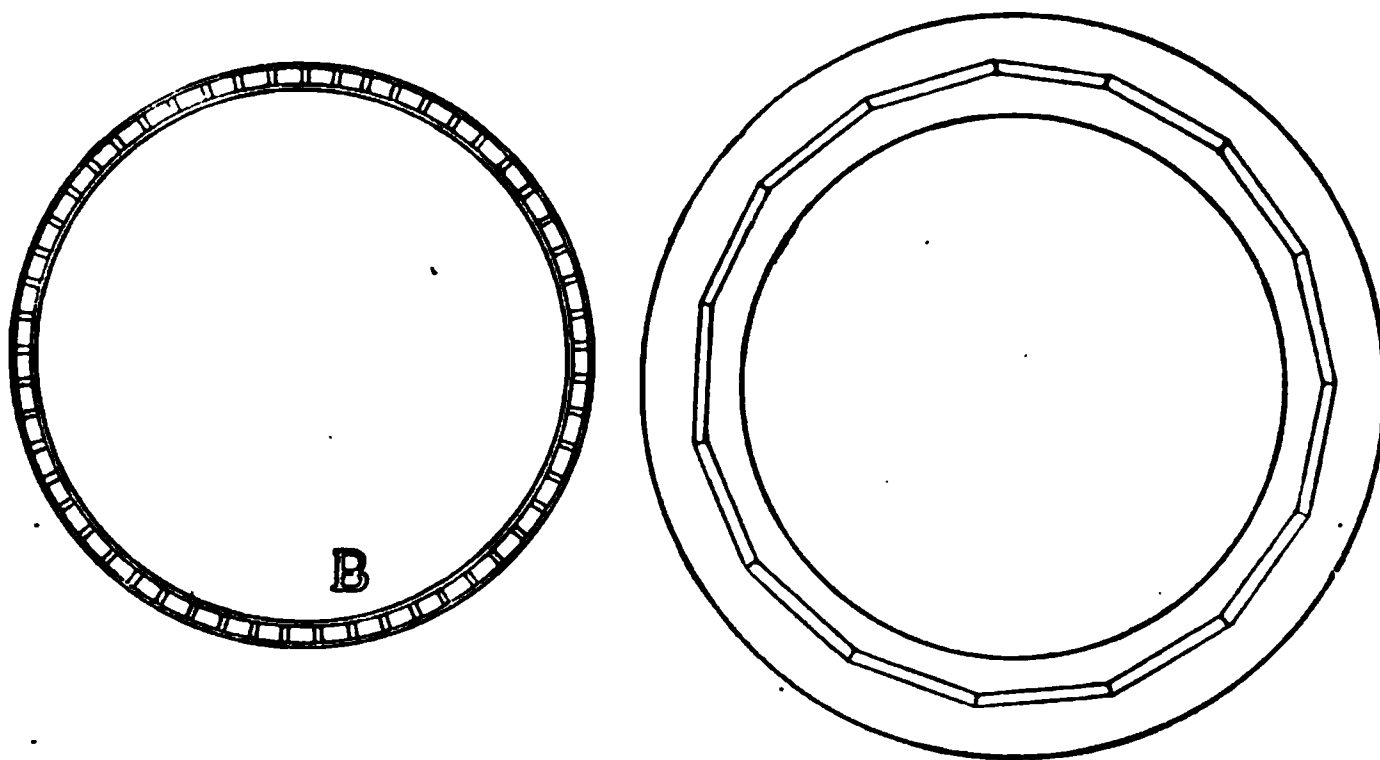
Showing method of making the sill of brick lined and of round wood silos. B, plan of studding for all-wood, brick lined or lathed and plastered silo.
